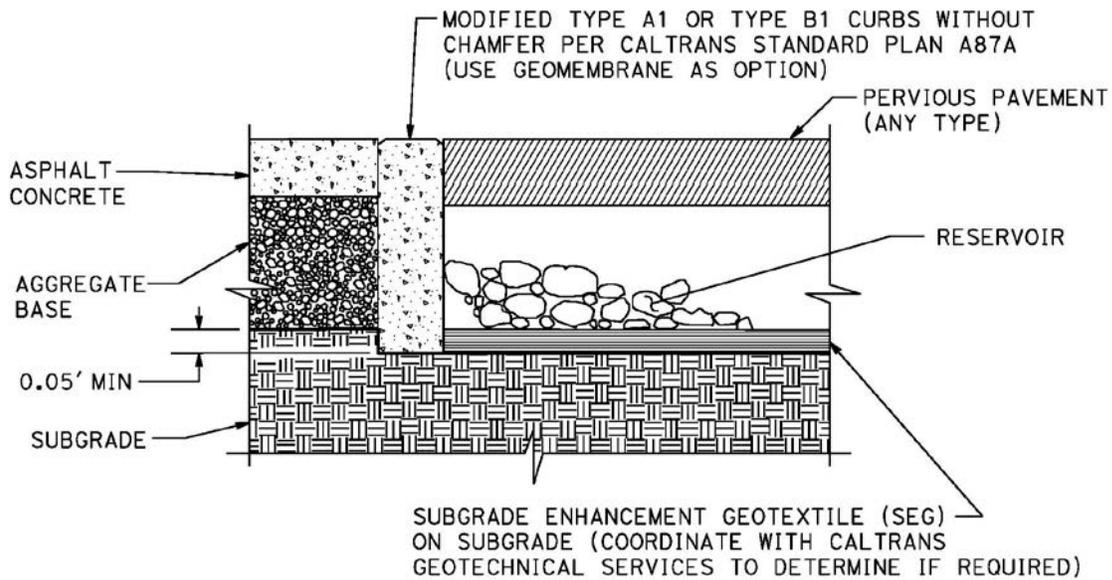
Cross section showing vertical barrier between pervious pavement and existing road (Caltrans Pervious Pavement Design Guidance, 2014)
